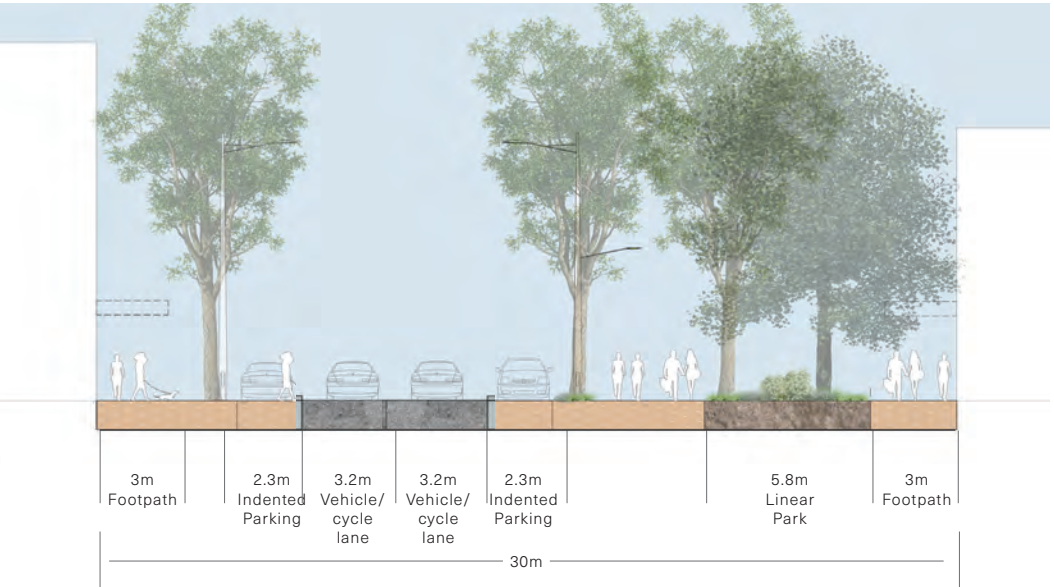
Gheringhap Street block 1 section A-A' showing the proposed condition
